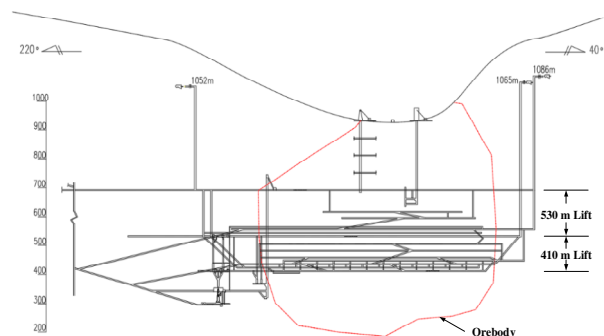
Lift layout in Phase II project of Tongkuangyu copper mine.
